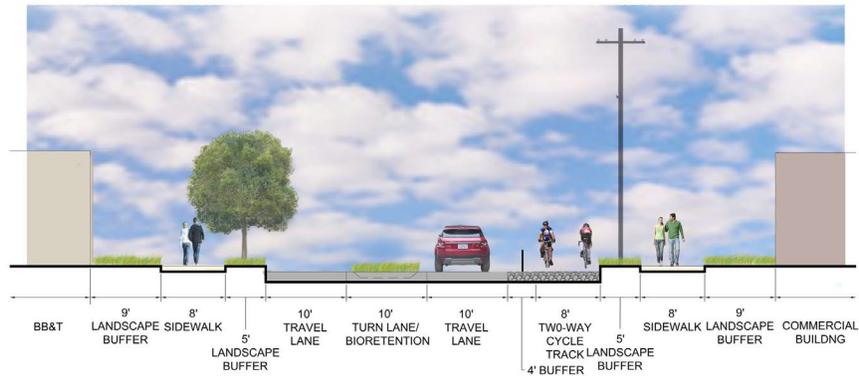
1st Street Underpass (7th Avenue to 5th Avenue)
